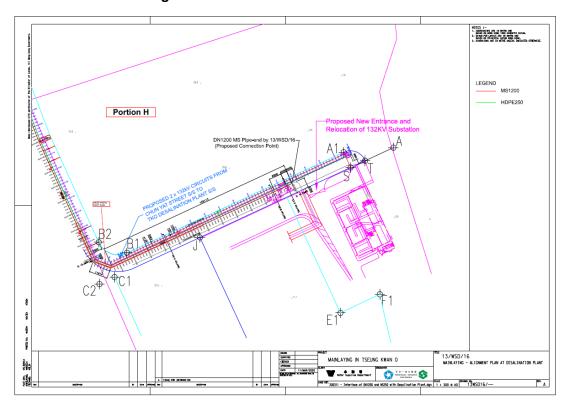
Location Plan for CH.CT 0+07 - 2+58
